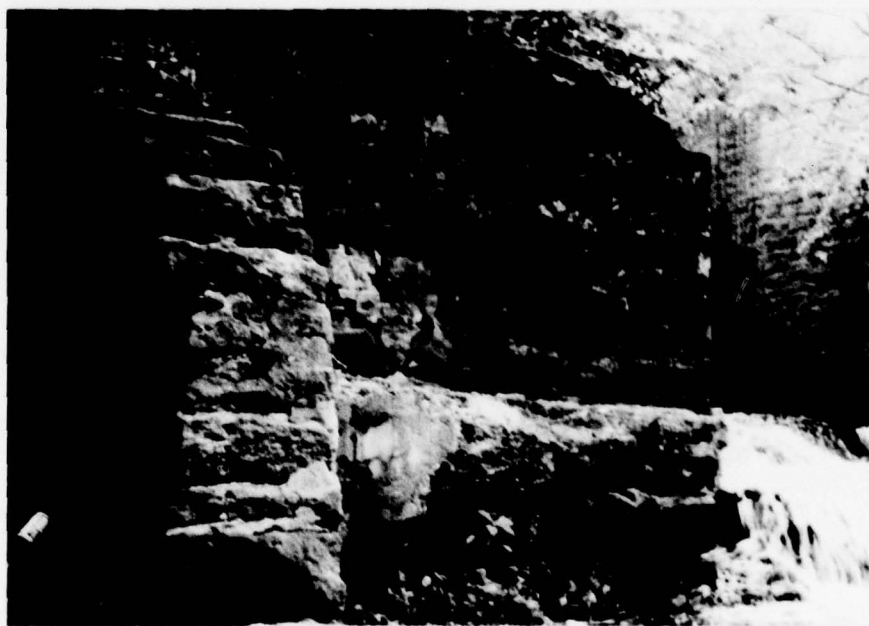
Detail of toe of right wingwall showing severe settlement cracks and undermining.
